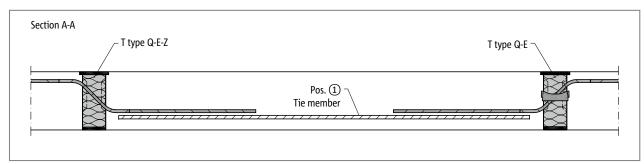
Schöck Isokorb® T type Q-E, Q-E-Z: Section A-A; one-way reinforced concrete slab
